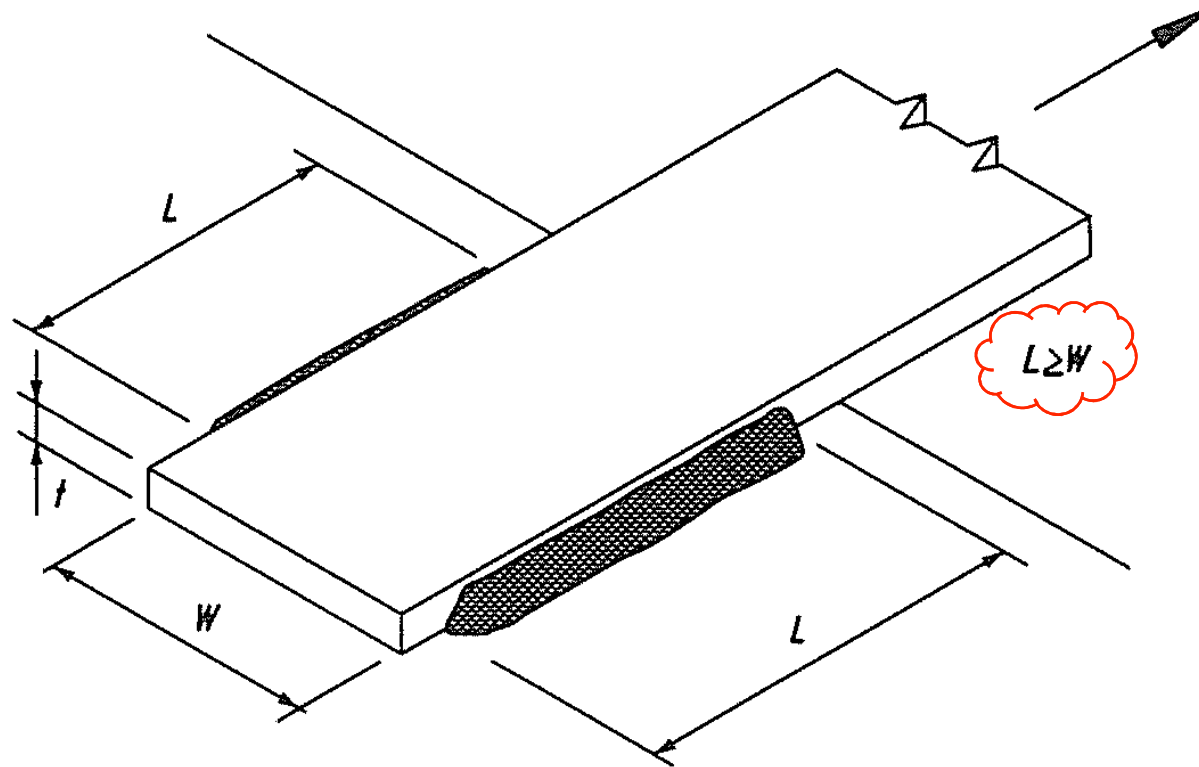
Longitudinal fillet welds.
